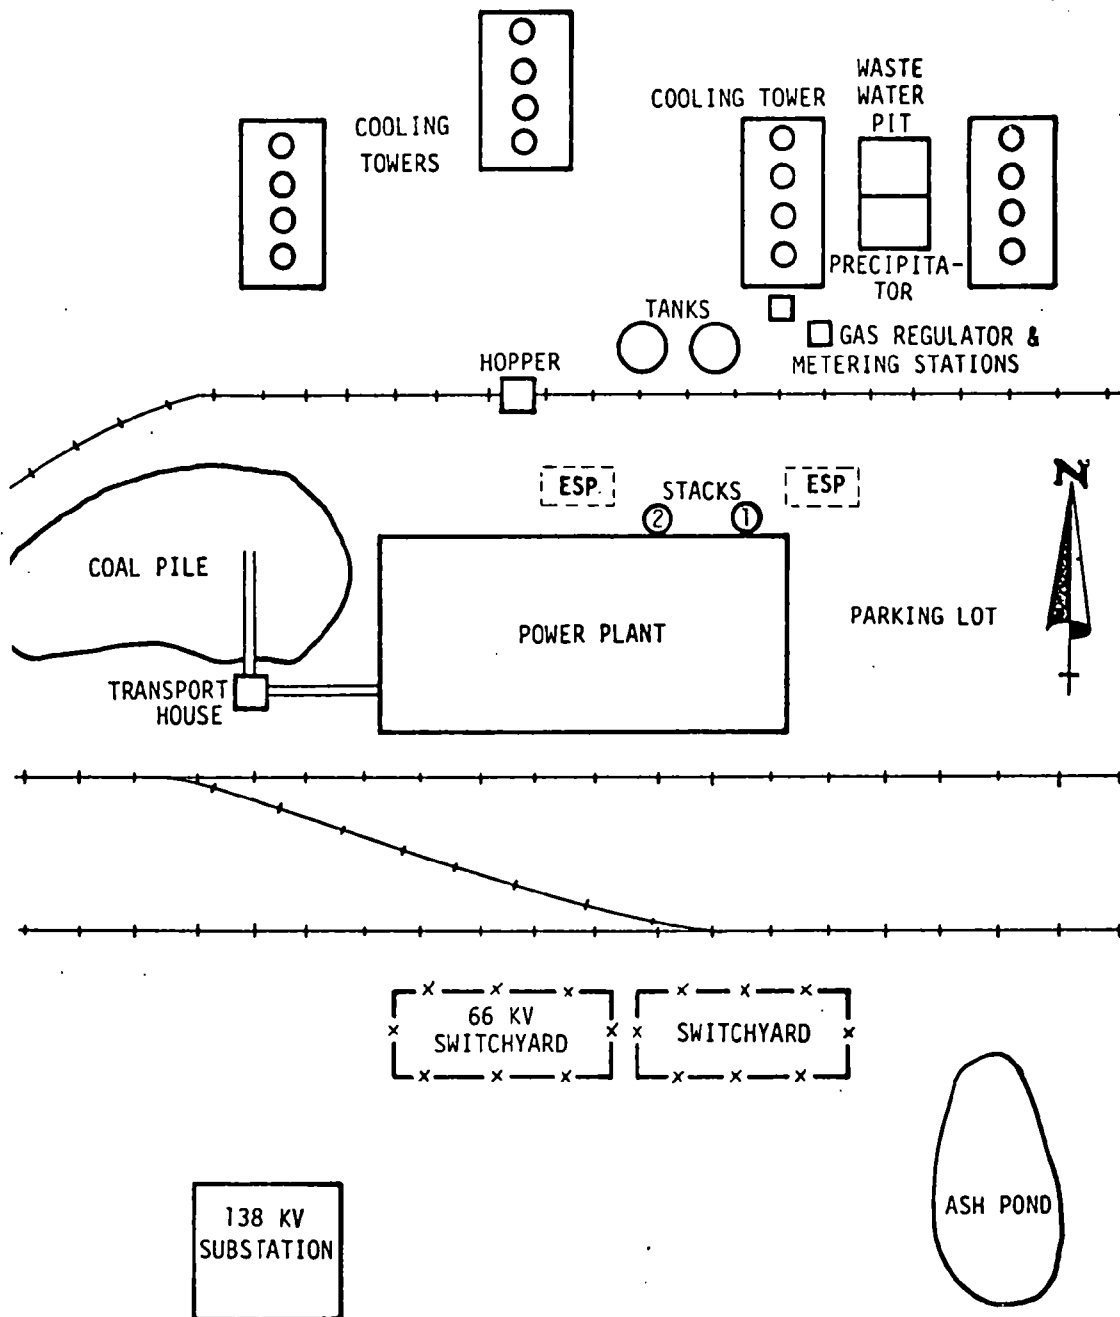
Site plan showing possible locations of new ESP's for Boilers 1 and 2 at the Mustang power plant.
